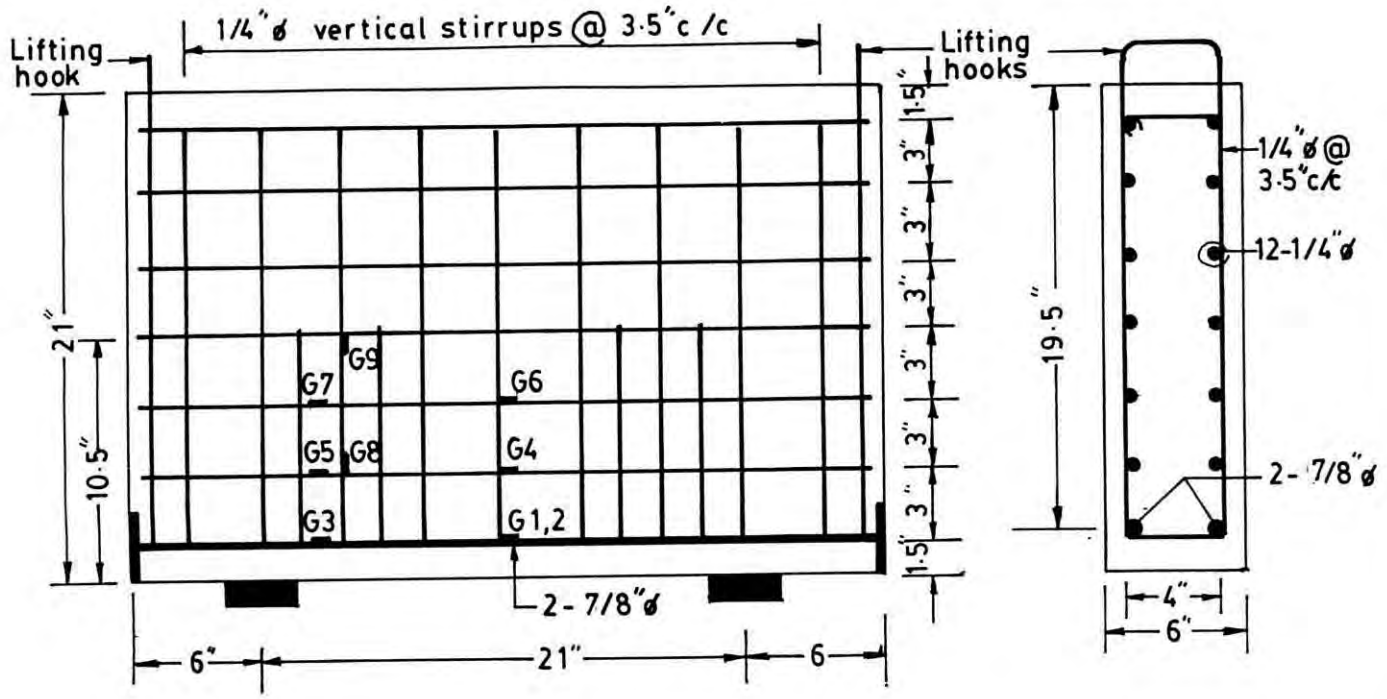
Reinforcement arrangement of Beam DB-P3
